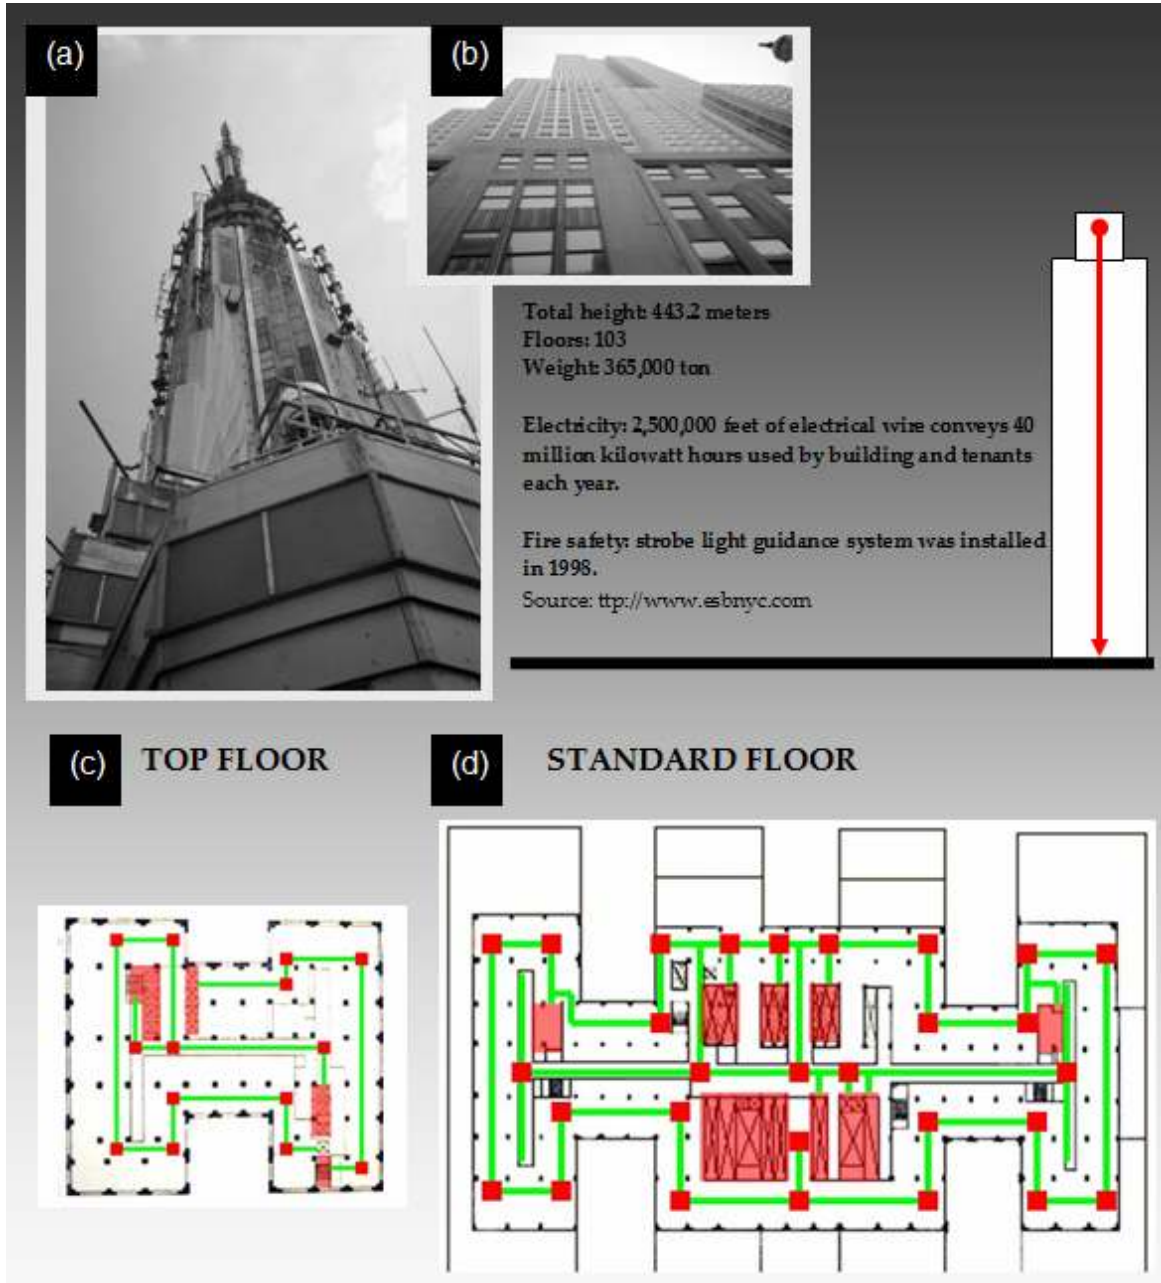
a-b) Top view and building plan of Empire State Building, New York City, US (2006). Schematic example of a functional dark adapted Emergency Plan: c) tower and d) standard floor plans for evacuation using the photoluminescent-warning ceramic tiles. This solution was planned based on the elemental circulation pathways. Not scaled (n/s). <http://www.safe-t-first.com/reference-standard-rs6-1.pdf>
